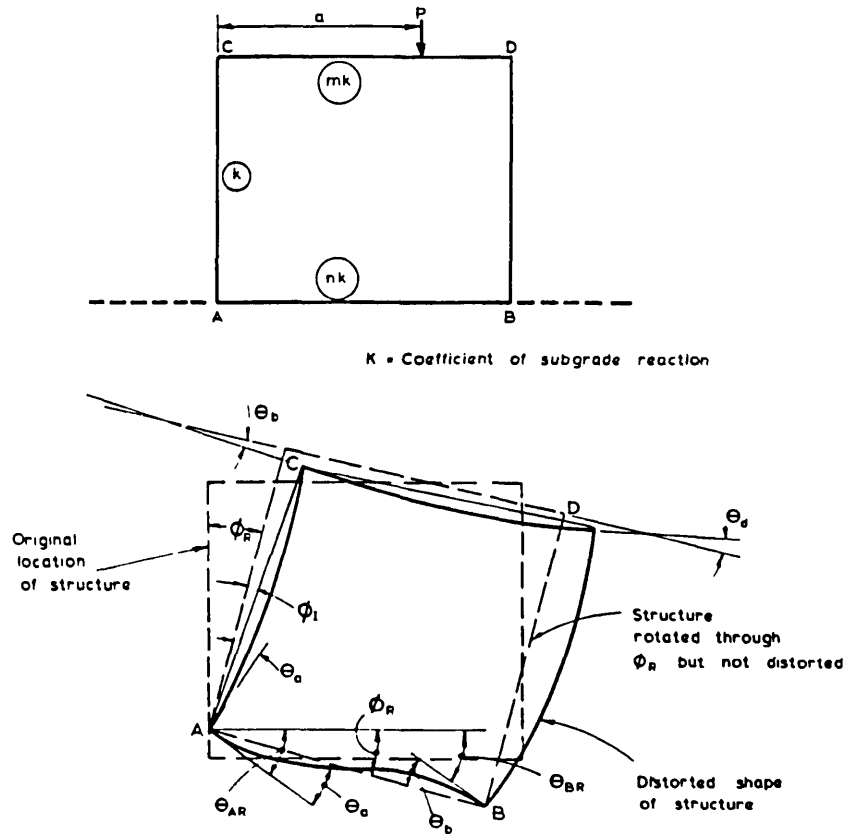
Deformation of a frame structure on flexible subgrade (after Lee and Harrison, 1970).
